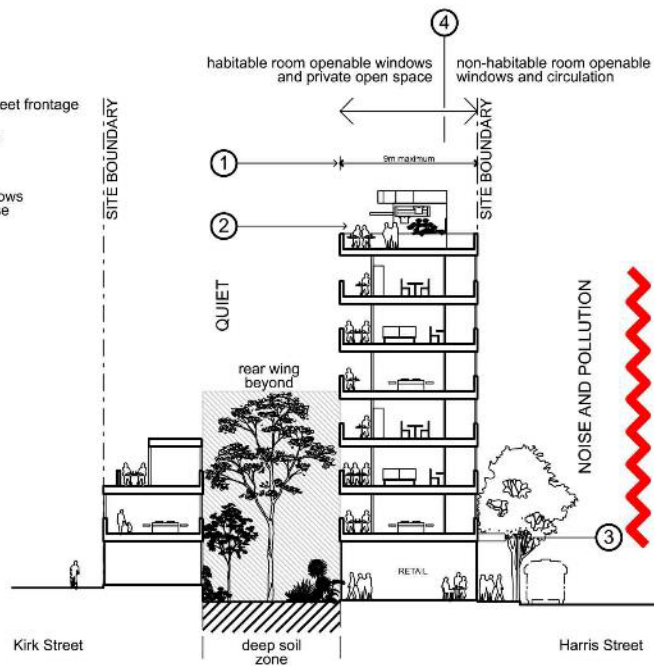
Street Cross Section – residential buildings between Harris Street and Kirk Street
